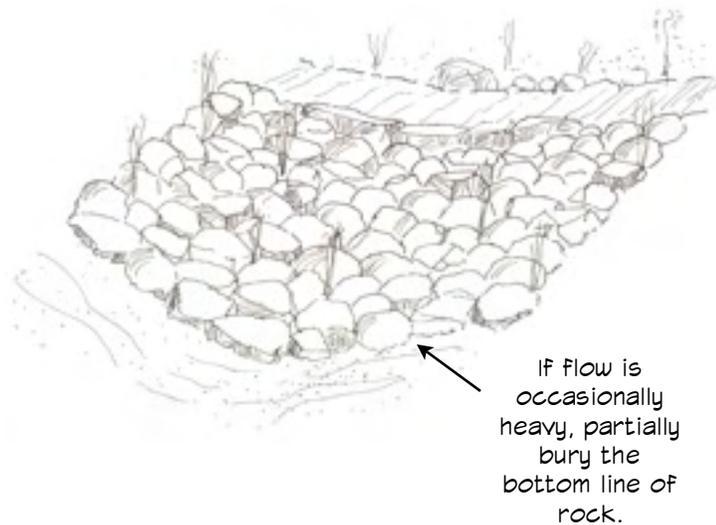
One-Rock Dam Below Shallow Drainage Crossing
